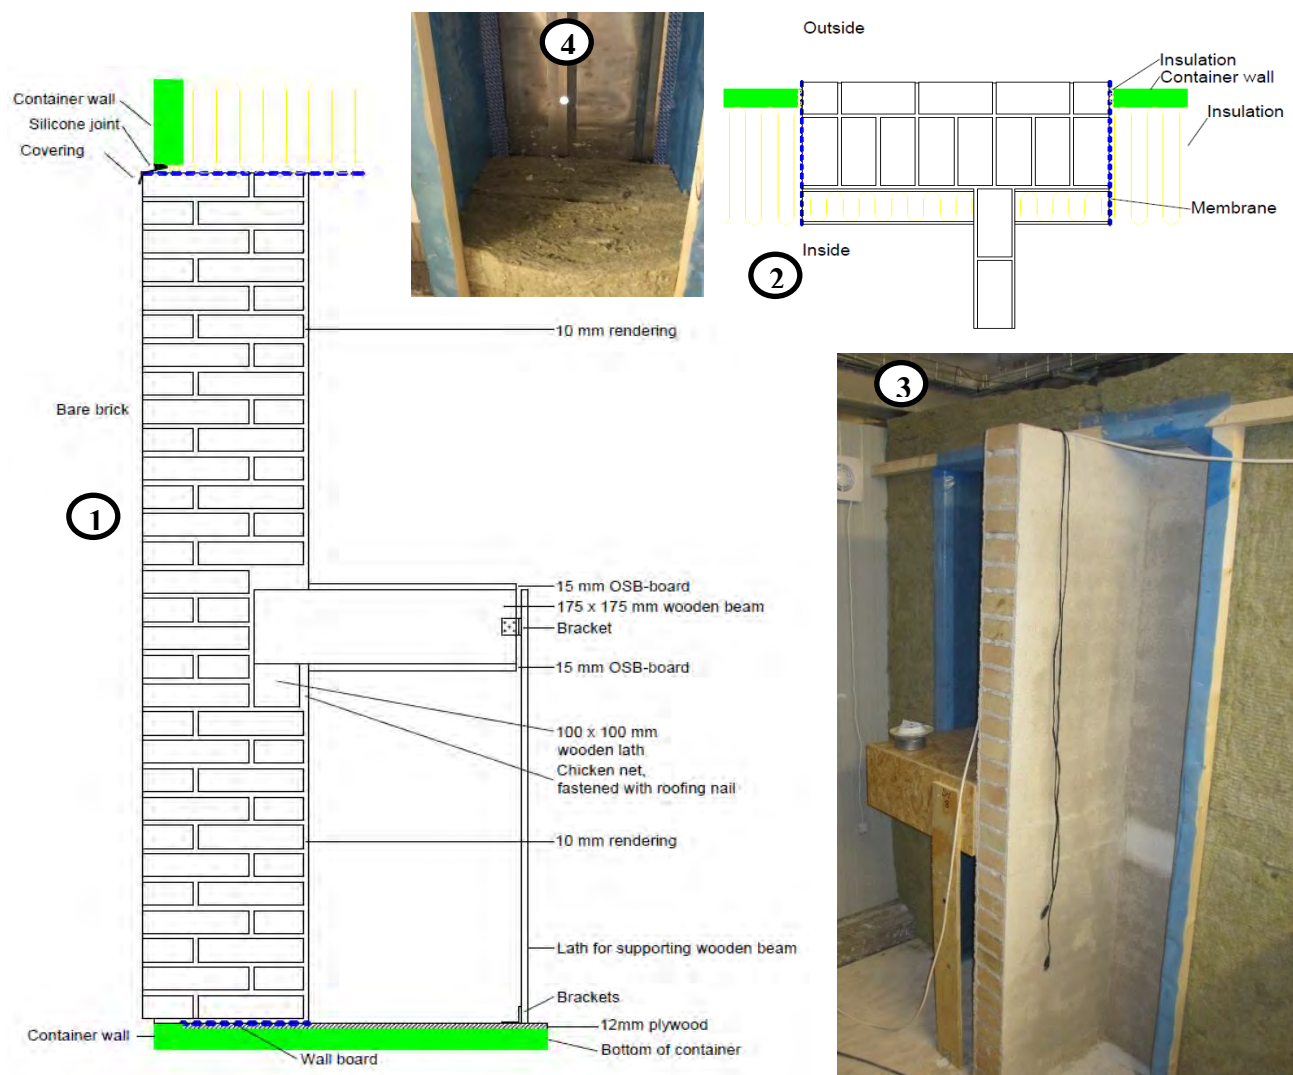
Container test set-up. 1) Vertical section through a masonry assembly with the intermediate floor structure. 2) Horizontal section through a masonry assembly with the adjacent internal wall. 3) Masonry assembly shown with surrounding vapour retarder and separating insulation. 4) Vapour retarder and insulation in the spacing between masonry assemblies.
